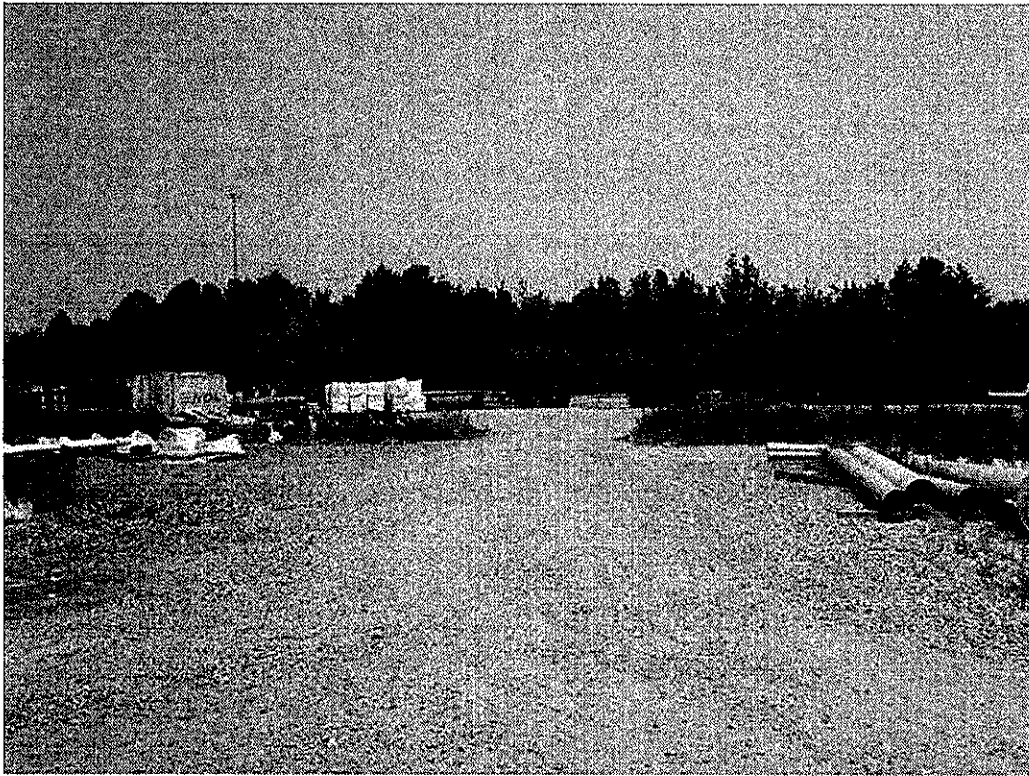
Phase I – Gravel cover area adjacent to Headworks Building.
